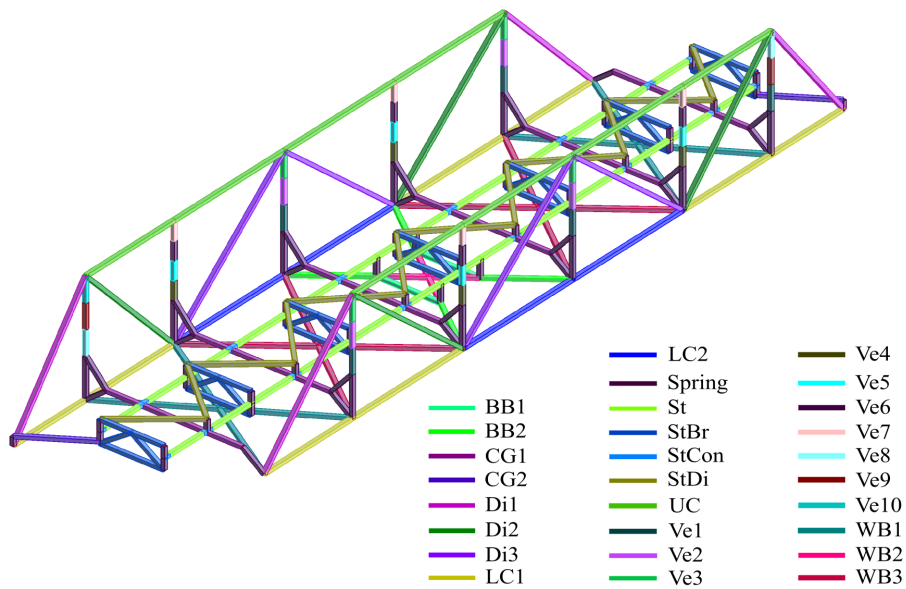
Replica of element model of Sokna Bridge showing cross-sections classes.
